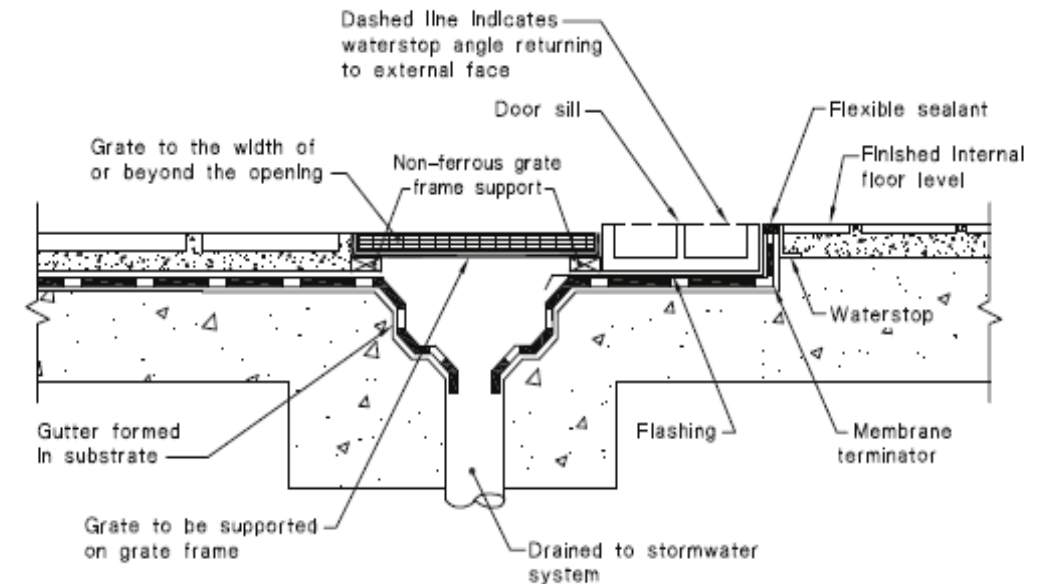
DETAIL OF MEMBRANE TERMINATION AT WALL OPENINGS WHERE THE INTERNAL AND EXTERNAL FINISHED FLOOR LEVELS DO NOT ALLOW THE UPTURN REQUIRED IN TABLE 2.1
